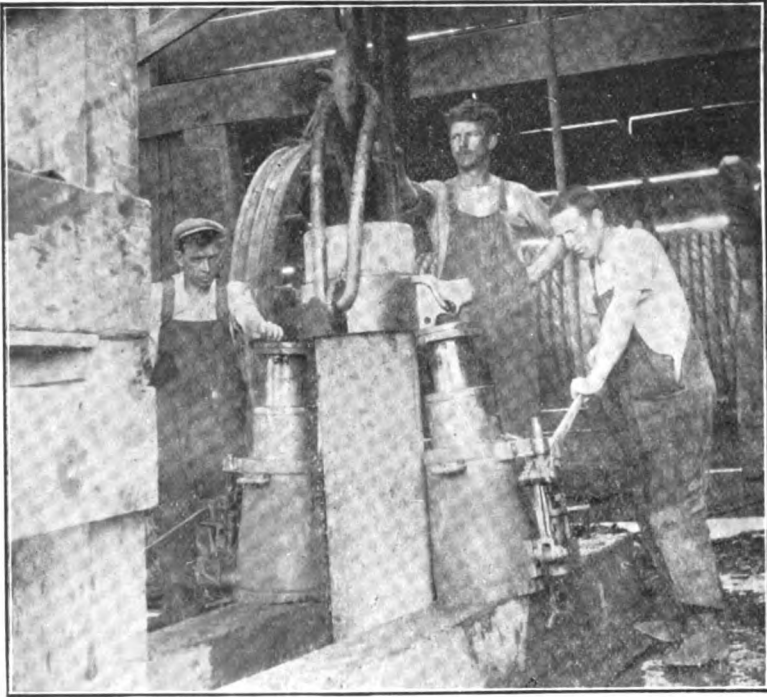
Pulling Casing with Hydraulic Jacks and Elevators
